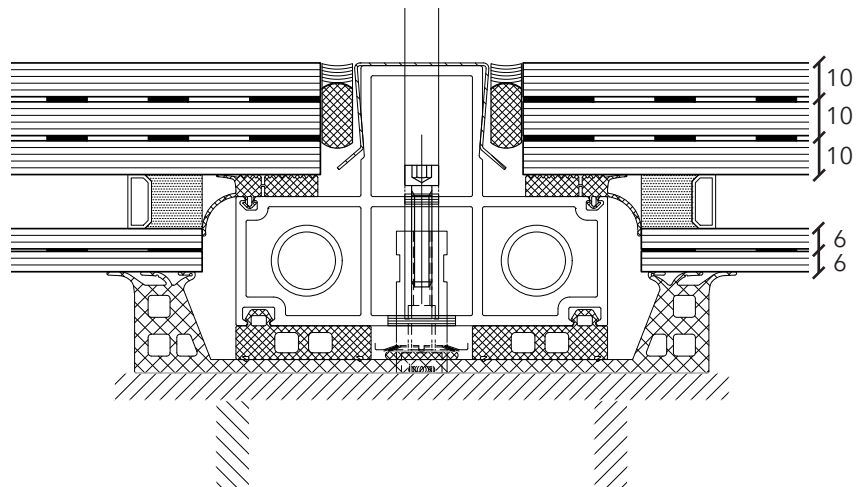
detail glassfloor (Scheldebouw, 2019)
